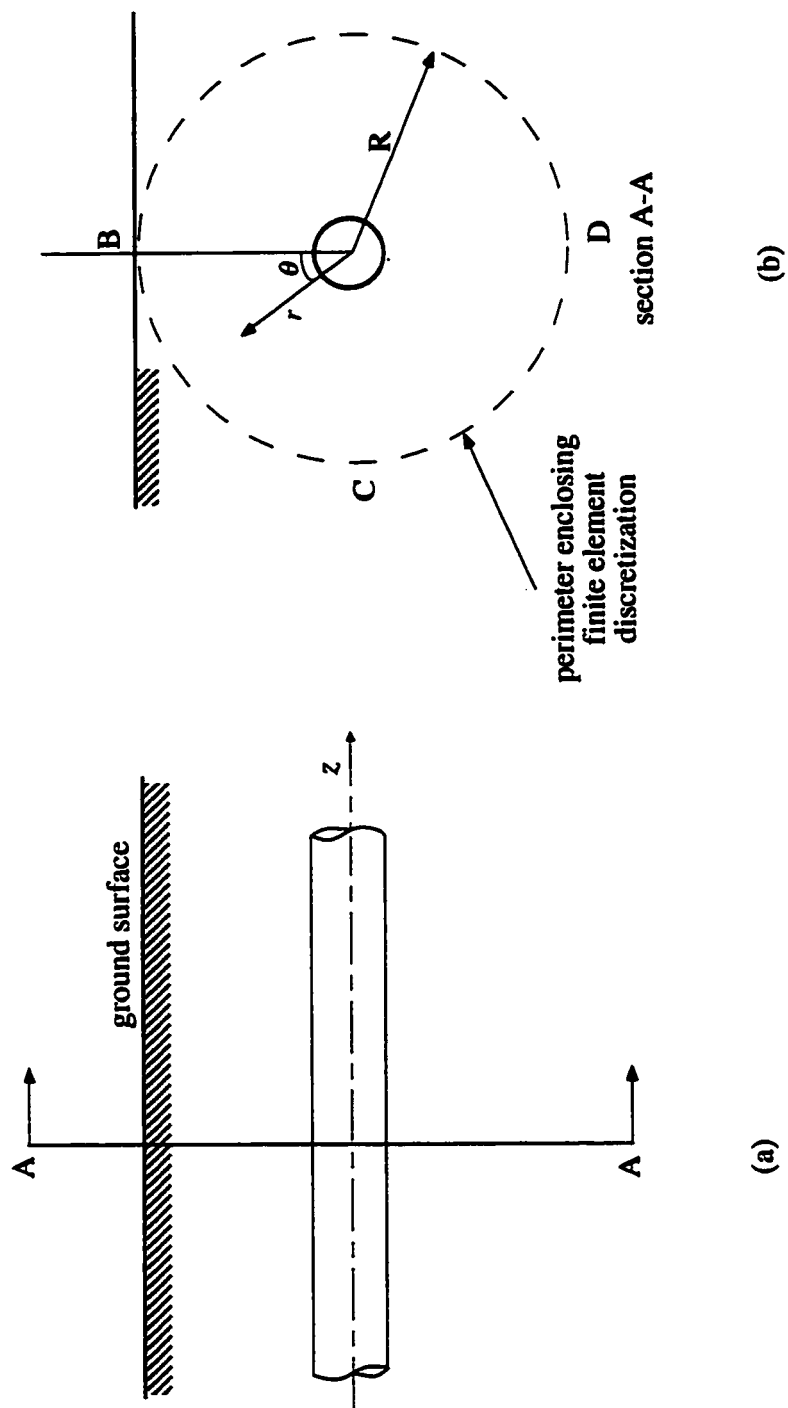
Longitudinal and Sectional Views of Buried Pipeline
